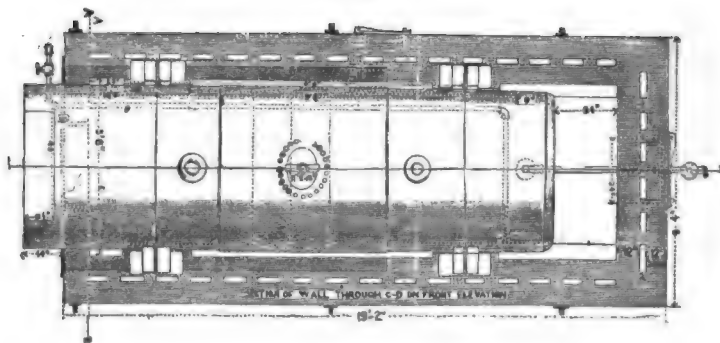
SETTING OF HORIZONTAL TUBULAR BOILER.
